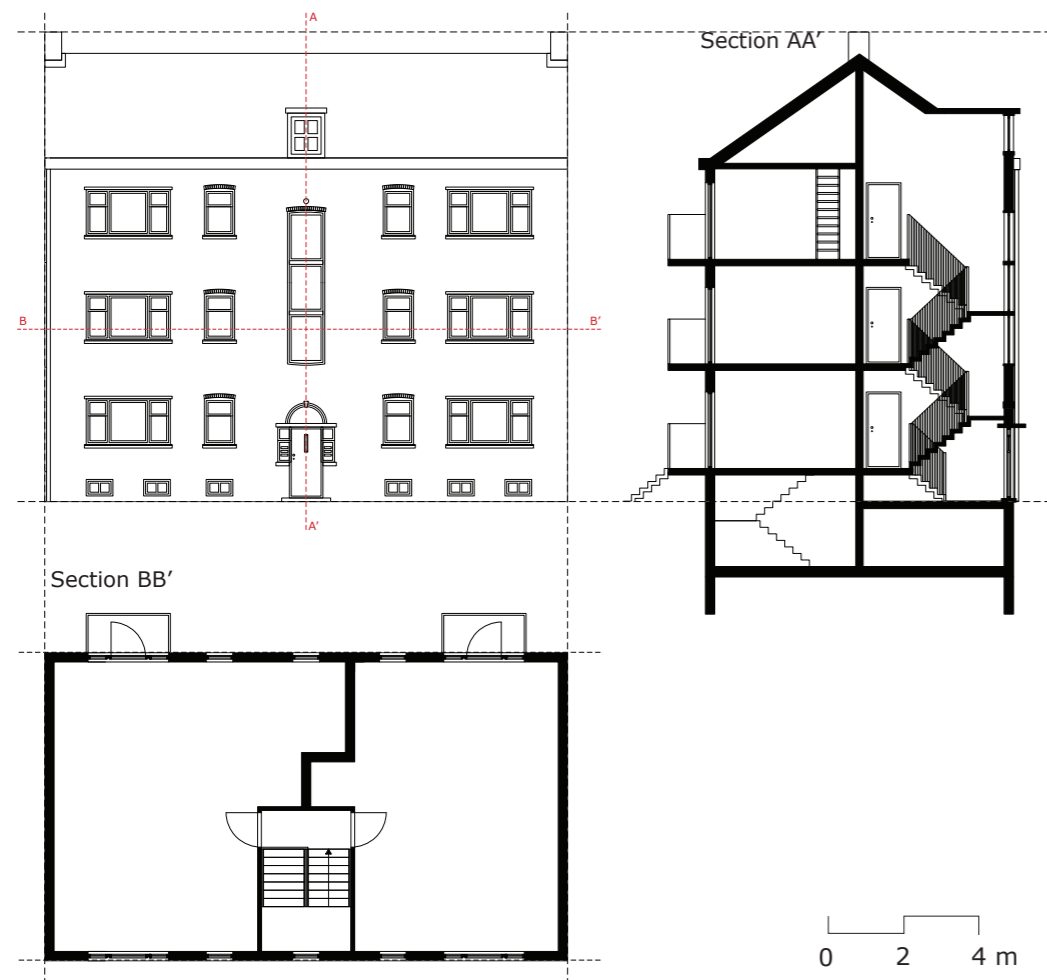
Architectural layout of a typical post-war apartment complex in Carnisse, showing the uniform elevation, floor plan and closed plinth design.
